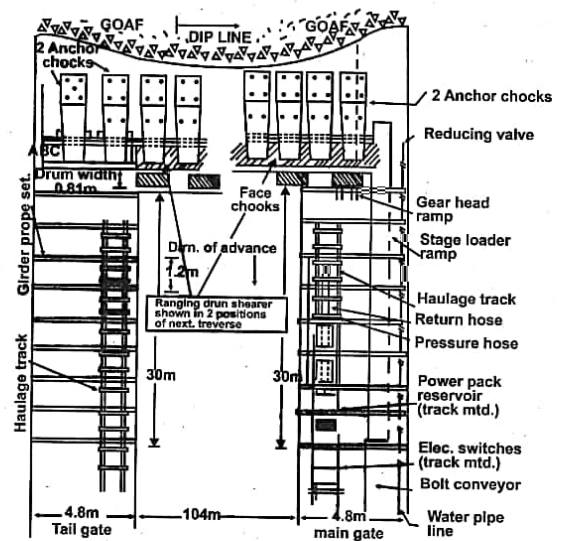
Layout of a longwall retreating face with caving at Pathekera
